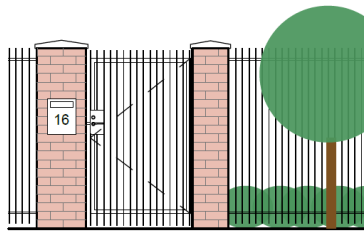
Permeable fencing – brick pier and full-height permeable infill panel
